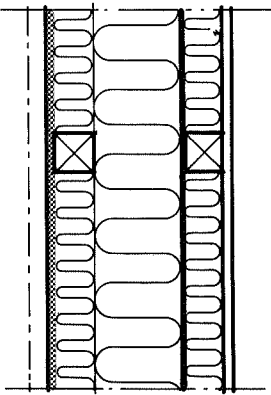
External walls with three layers of insulation. Three layers of insulation can also be used in walls using frameworks of the system shown in figure 37.
